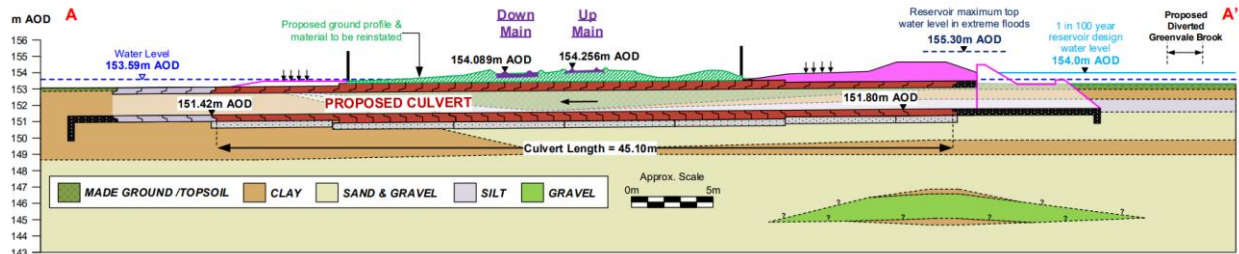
Conceptual model drawing showing the geology, groundwater level and culvert construction details.
